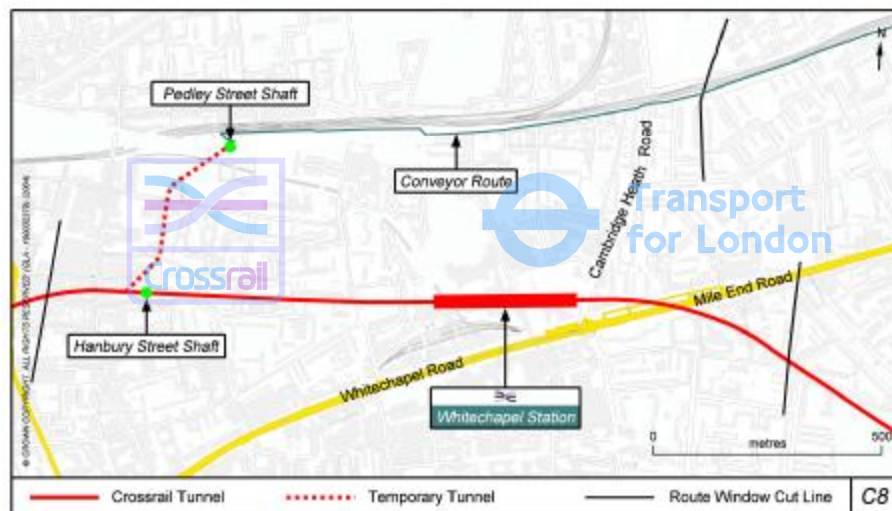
Location of worksites and Crossrail stations within route window C8
